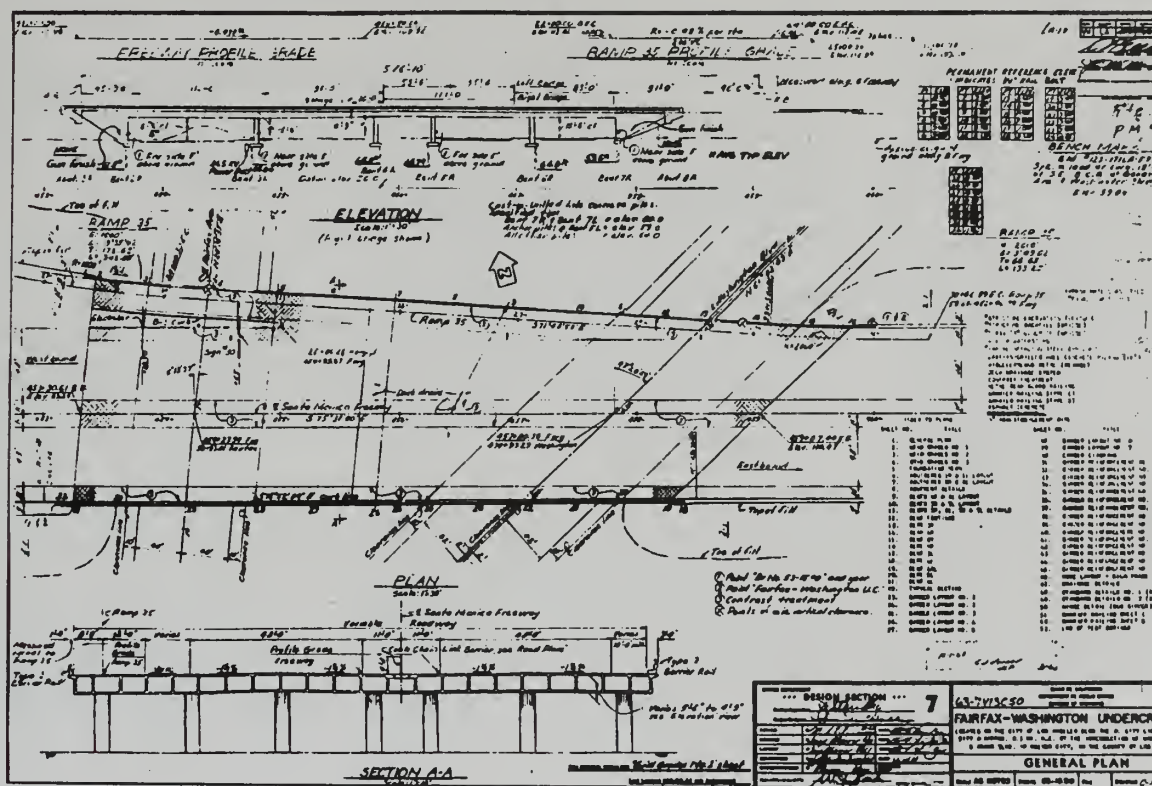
General Plan of Fairfax-Washington Undercrossing (53-1580).
